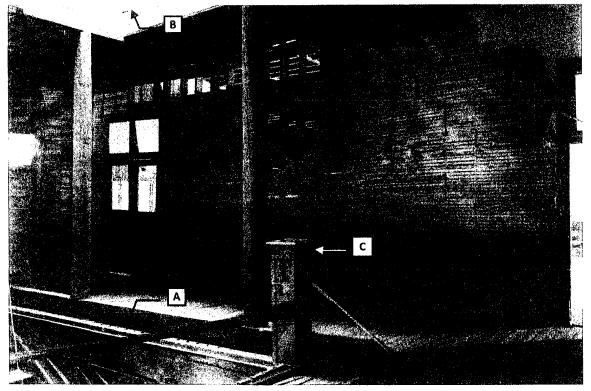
Level 3 Stair Hall view southeast. (A) Handrail and spindles are missing, (B) Skylight, (C) Newel post is missing finial.
